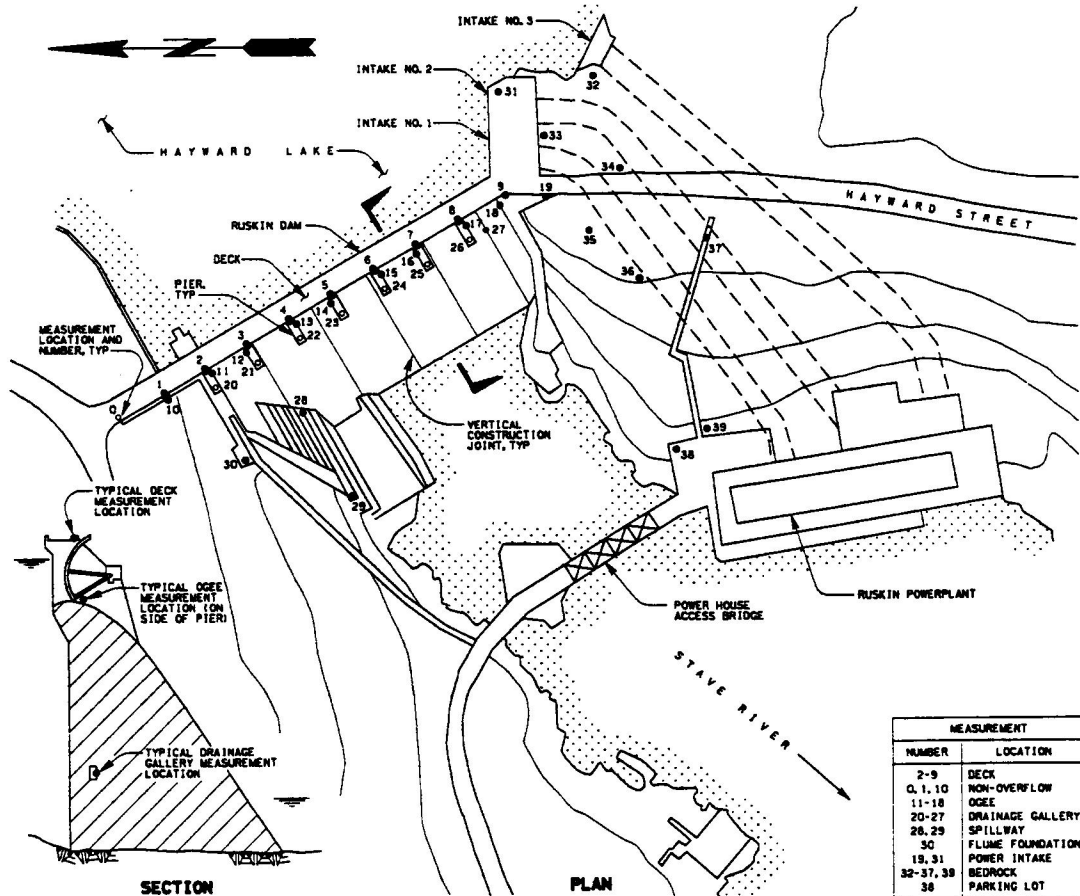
RUSKIN DAM - SITE PLAN SHOWING AMBIENT VIBRATION MEASUREMENT LOCATIONS
